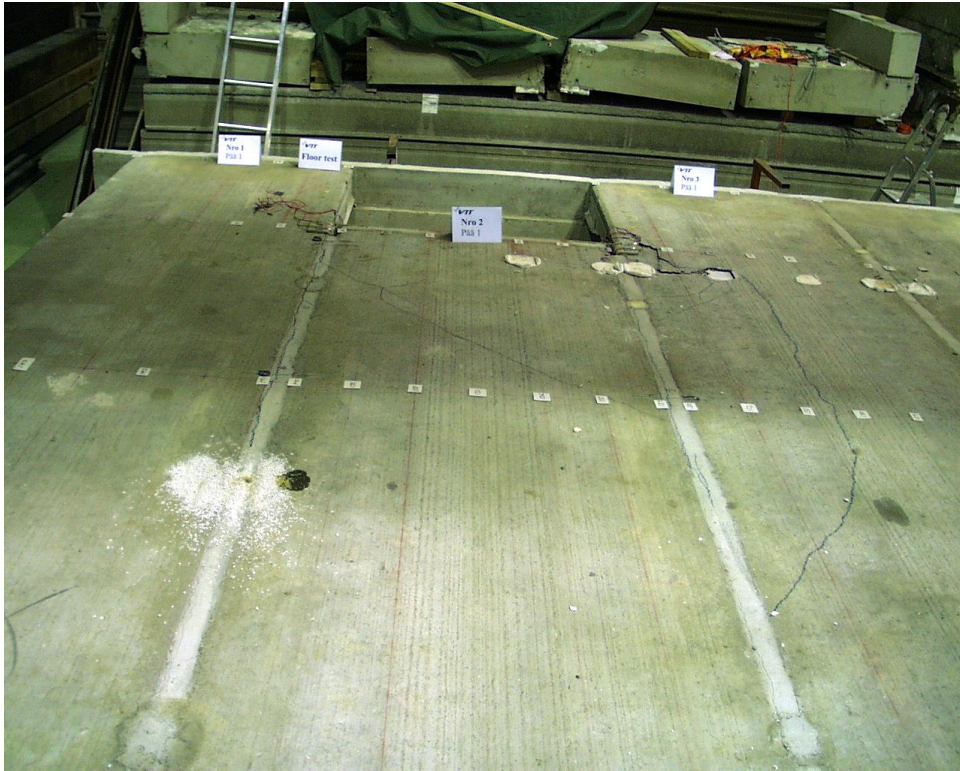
FT200:11. Cracks on top surface of slab 3 after failure.
